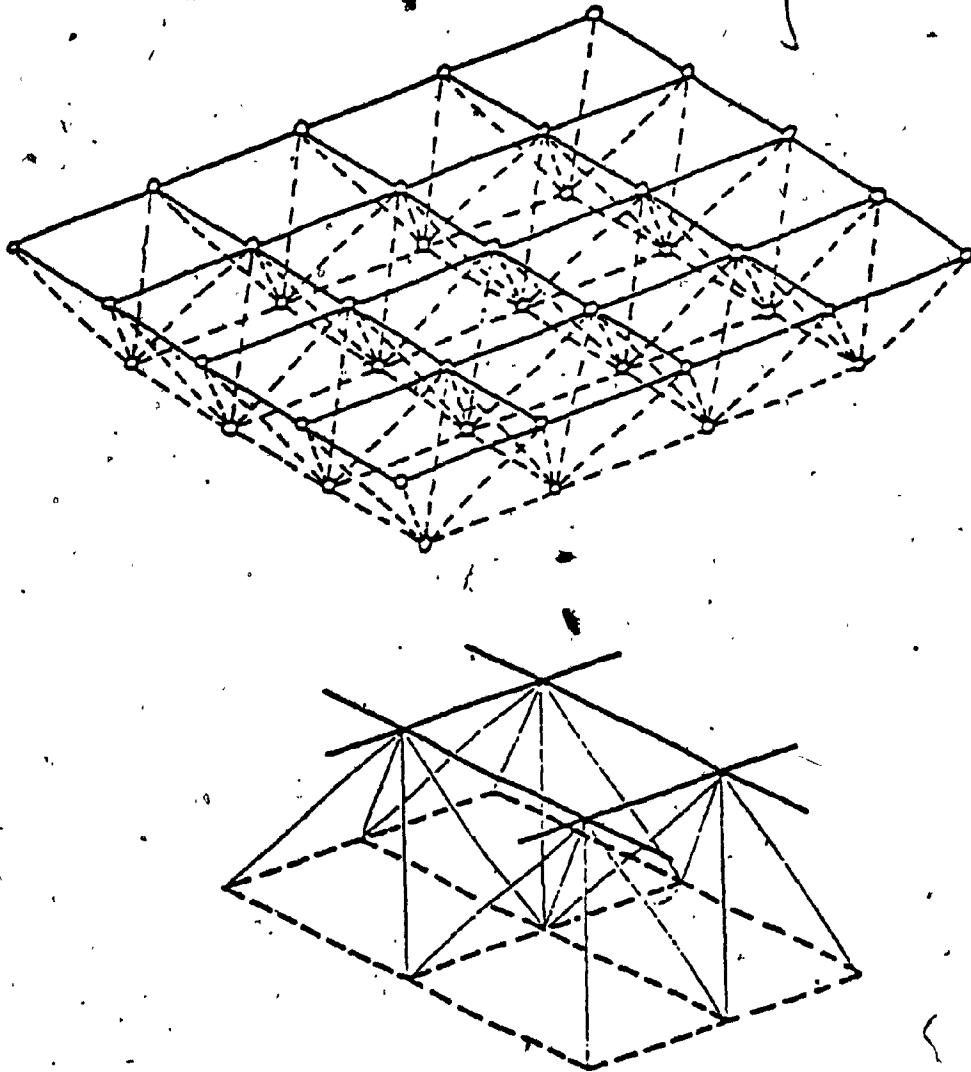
ORTHOGONAL GRID SPACE TRUSS
